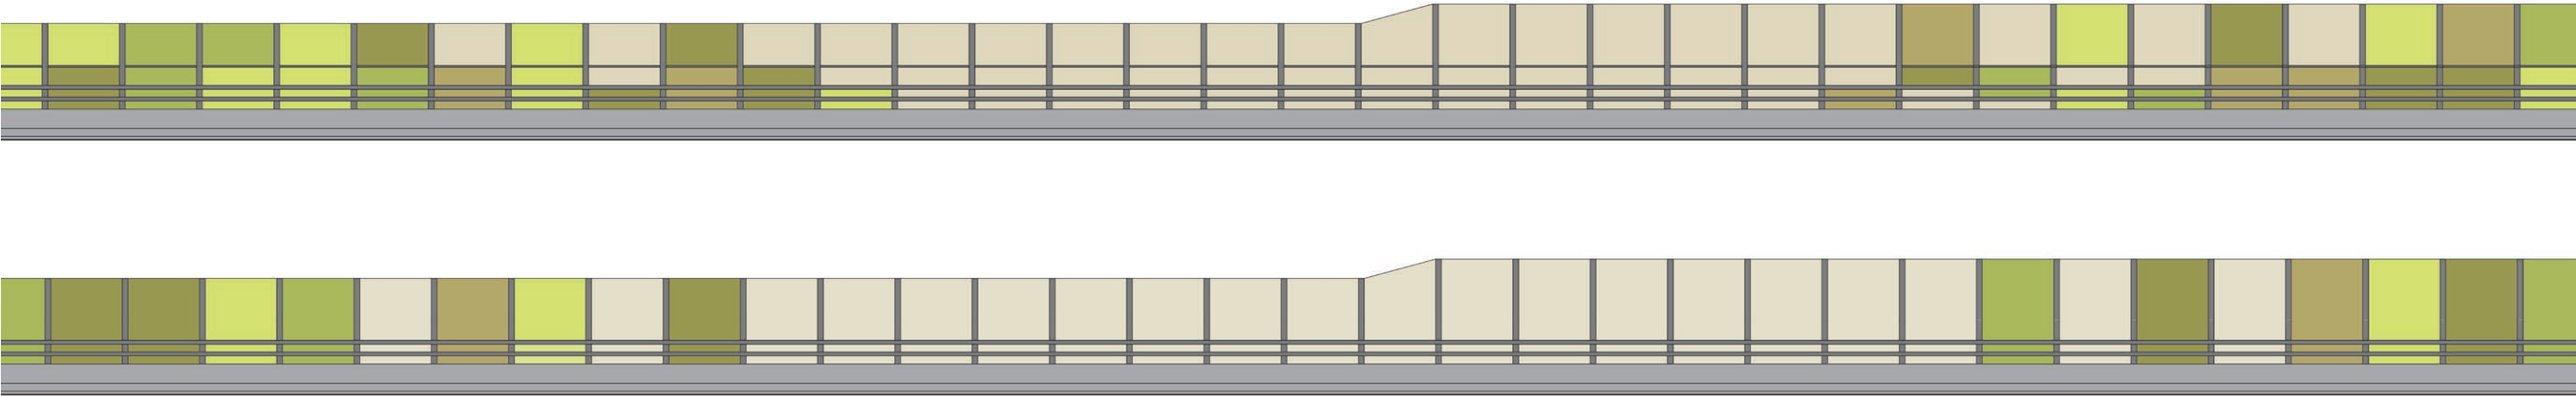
Indicative Elevation and Detailed Profile of Noise Wall Type 2
